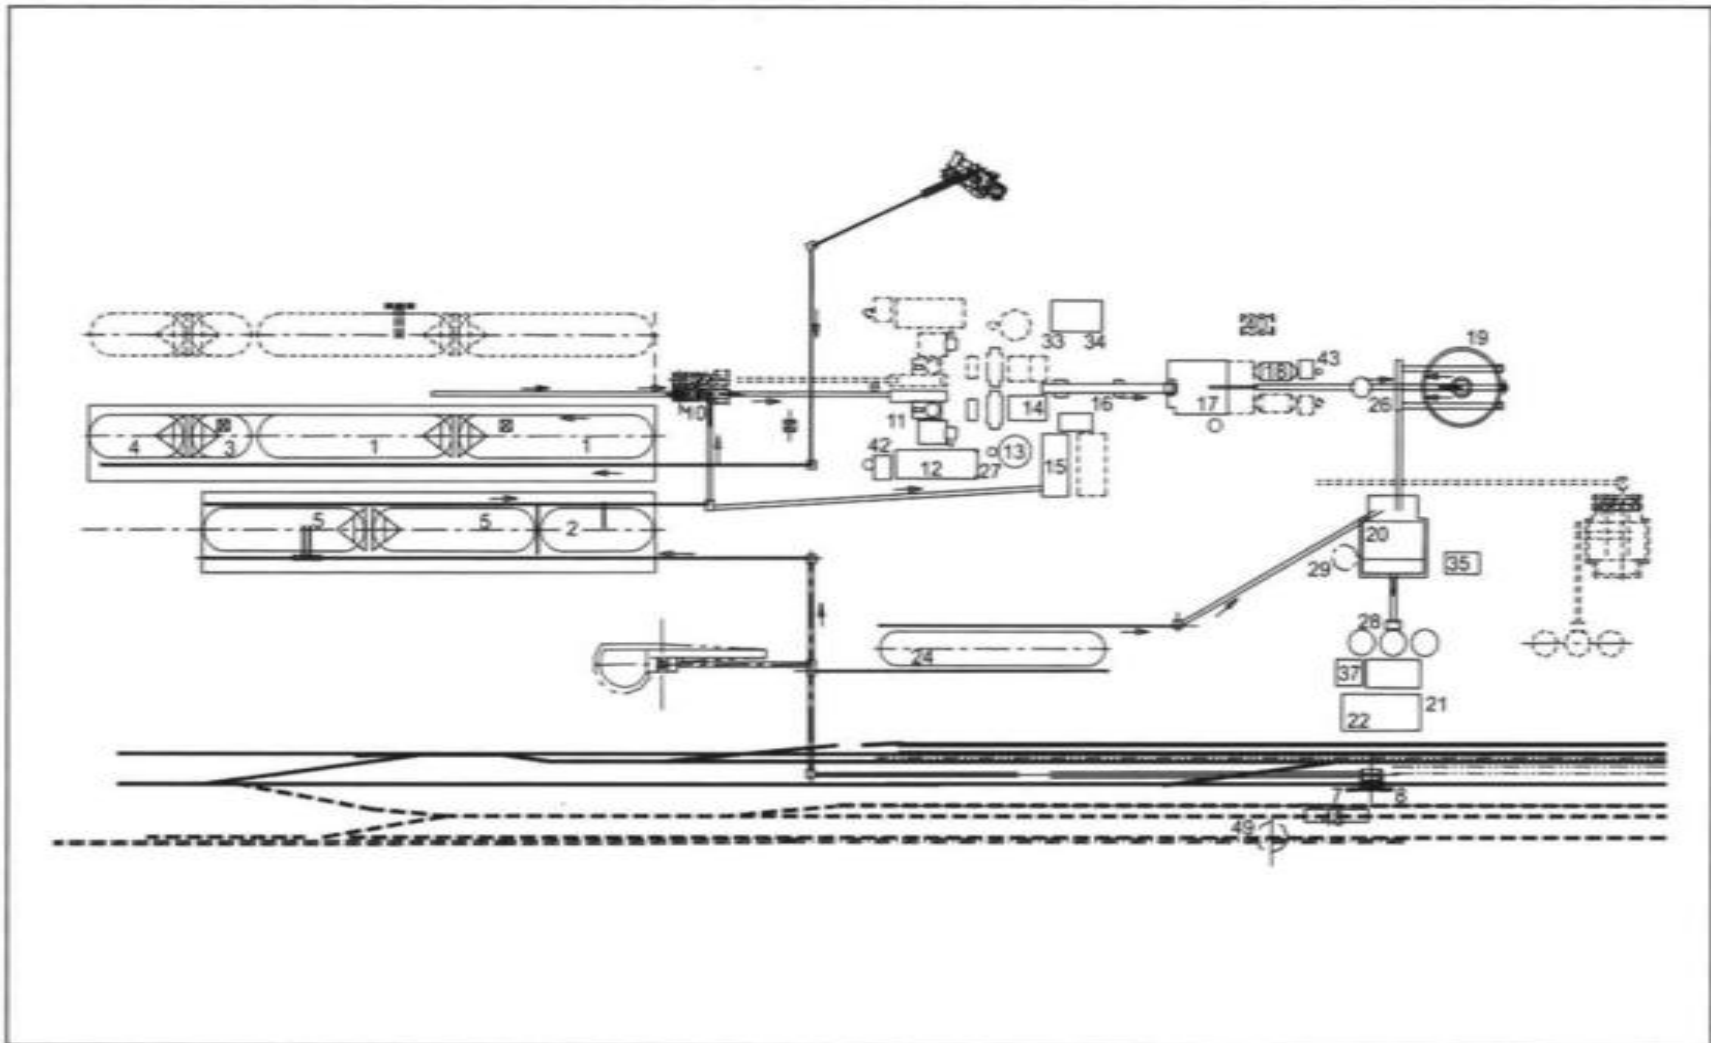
General plant layout of a 1.2 MTPA capacity cement plant.
